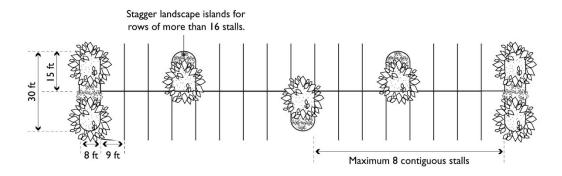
B.4: INTERIOR PARKING LOT LANDSCAPE ISLANDS
